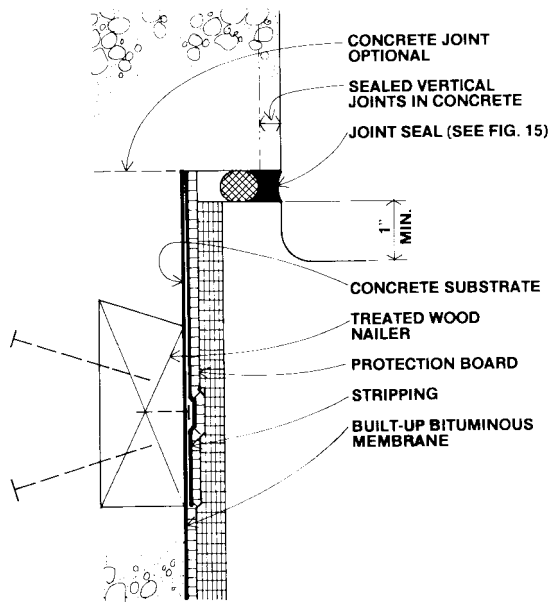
Terminal Condition Above Finish Grade on Concrete Wall (see 9.8.8 and 9.8.8.2)
